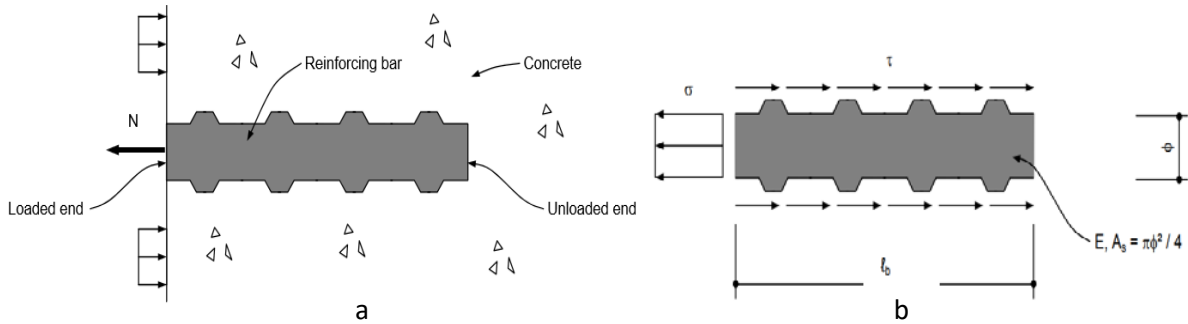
Schematic of pullout test (a); tensile stress and bond stress of a reinforcing bar element with one loaded and one unloaded end (b)
